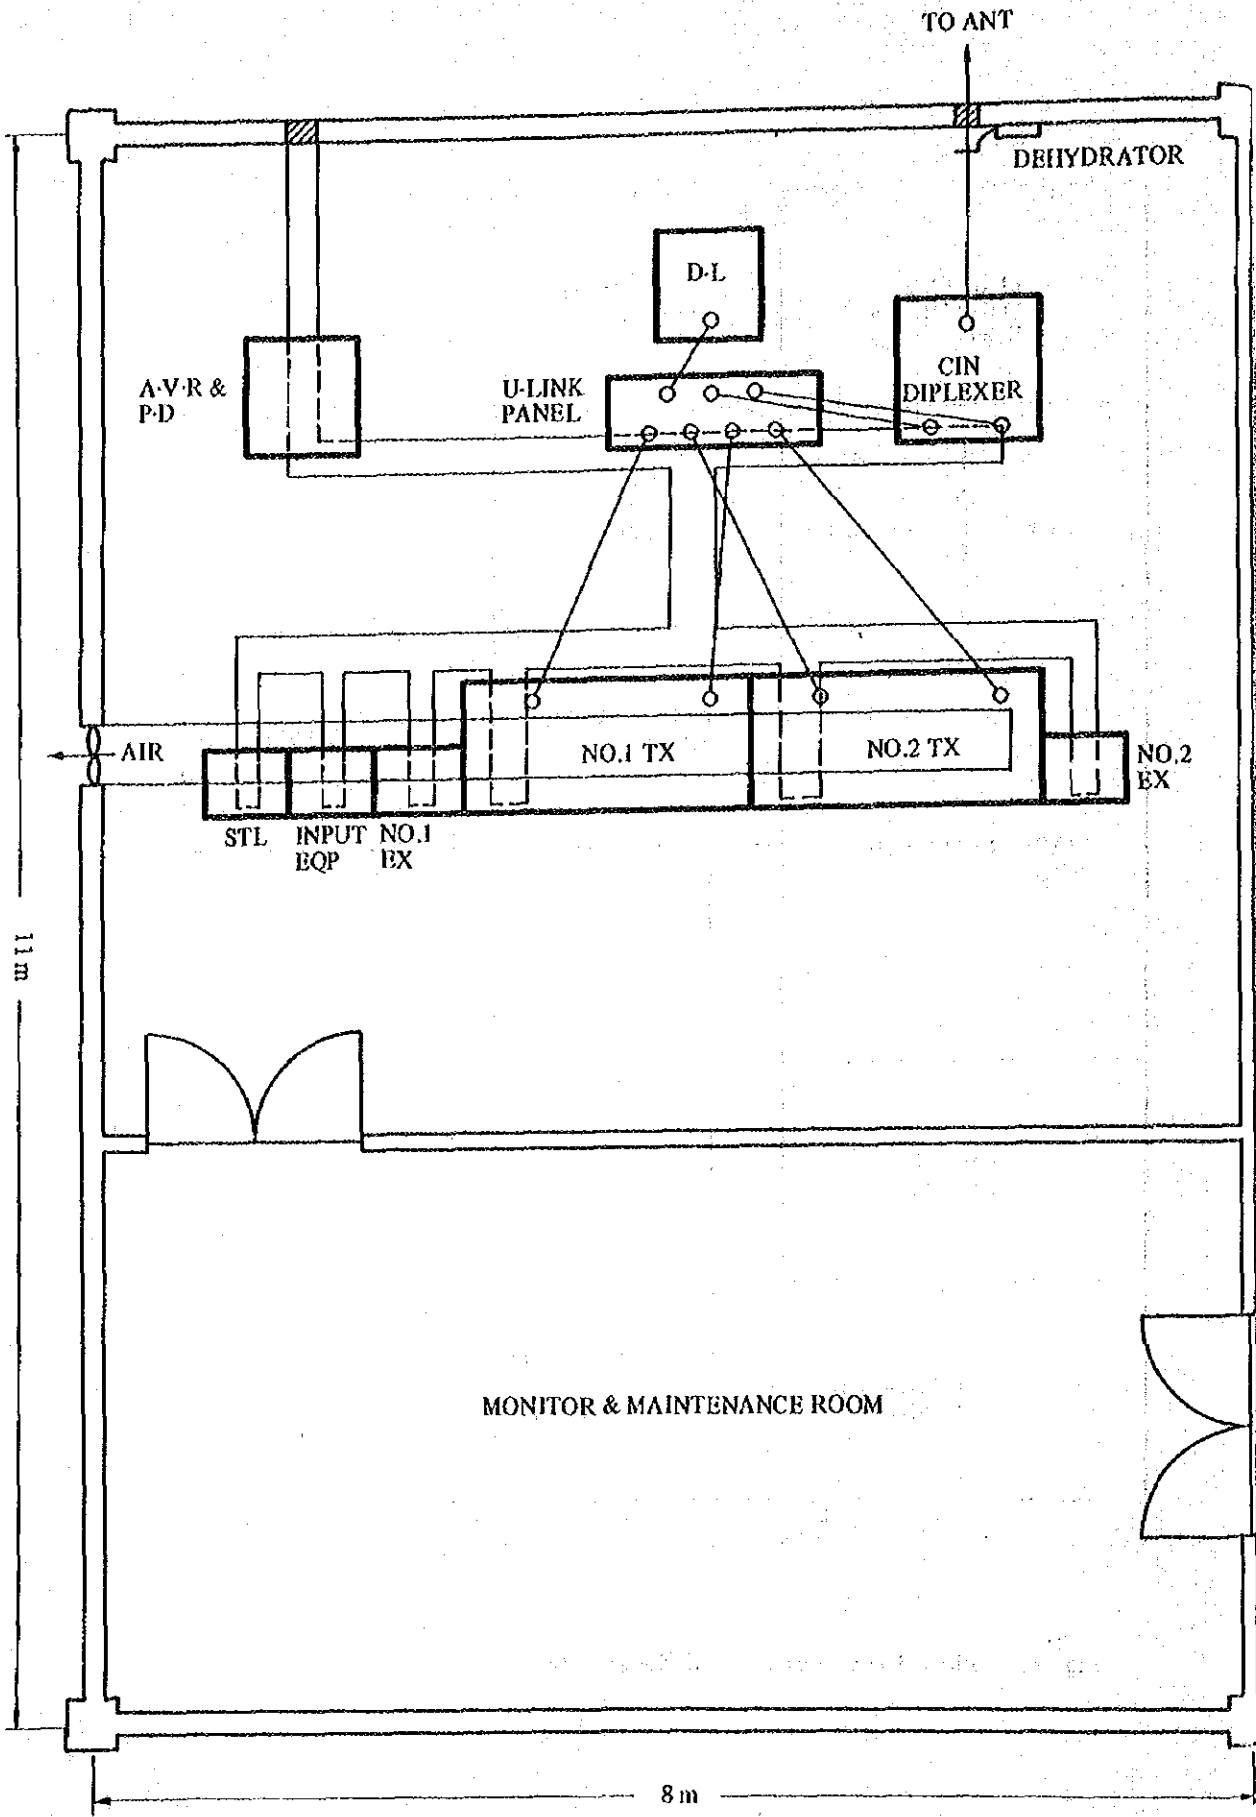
Floor Layout of VHF 10kW TV Transmitting Station
